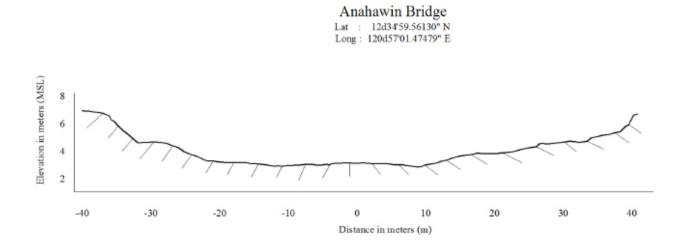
The downstream side of the Anahawin Bridge cross-section survey drawn to scale
